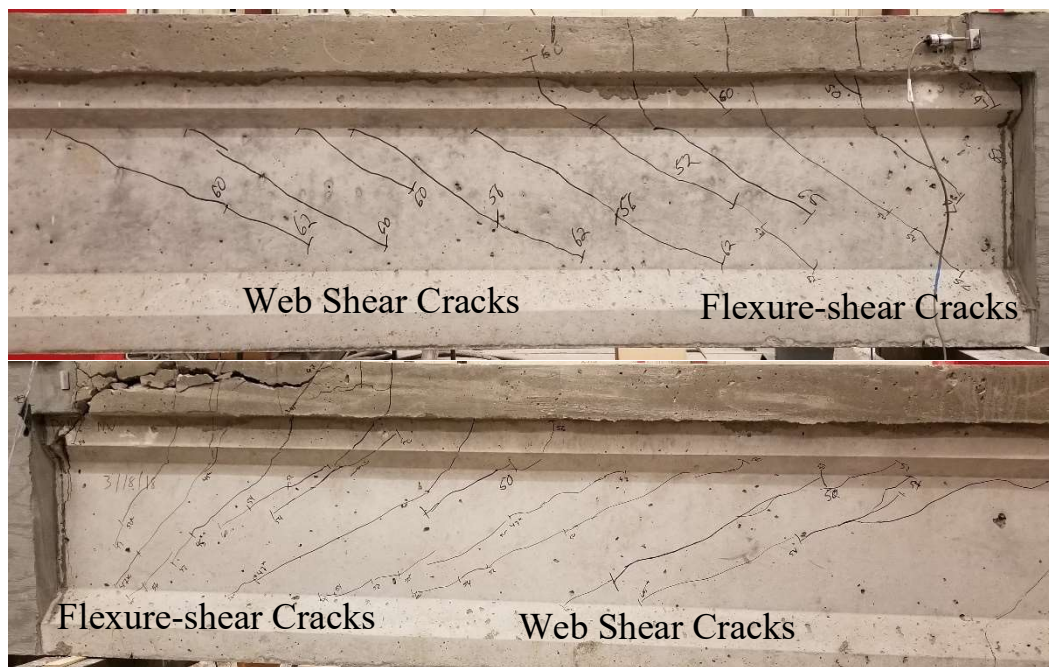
NC2-N girder with flexure-shear and web shear cracks (top) and NC2-S girder with flexure-shear and web shear cracks (bottom).
